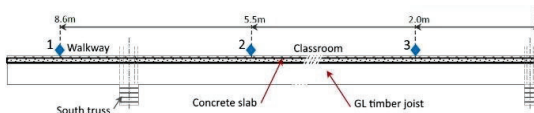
Geometry of the TCC floor. The two supporting trusses with different cross-sections are visible. 1, 2 and 3 are the sensors positions (§4.2)
